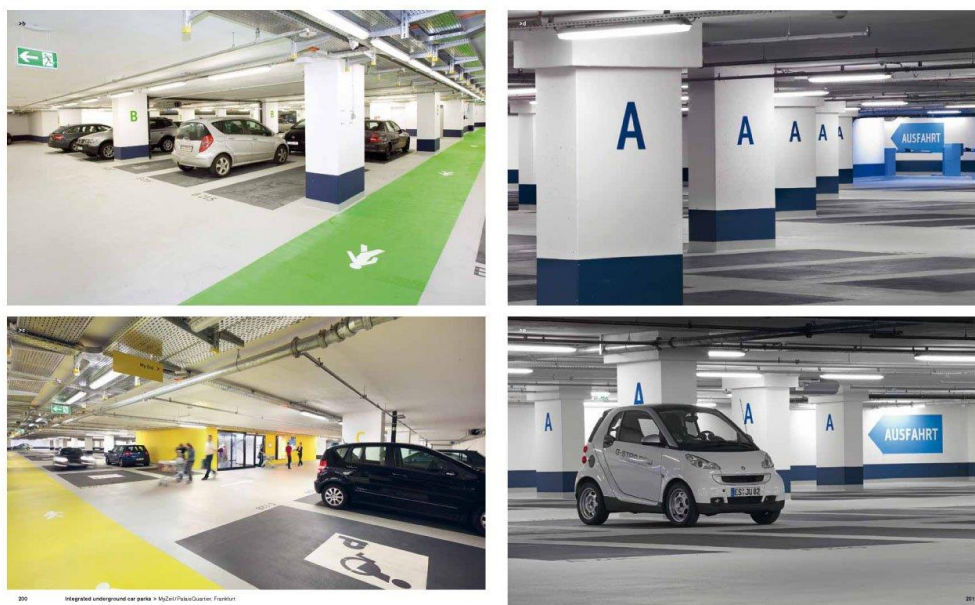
MARKINGS IN DRIVEWAYS AND PARKING SPACES
